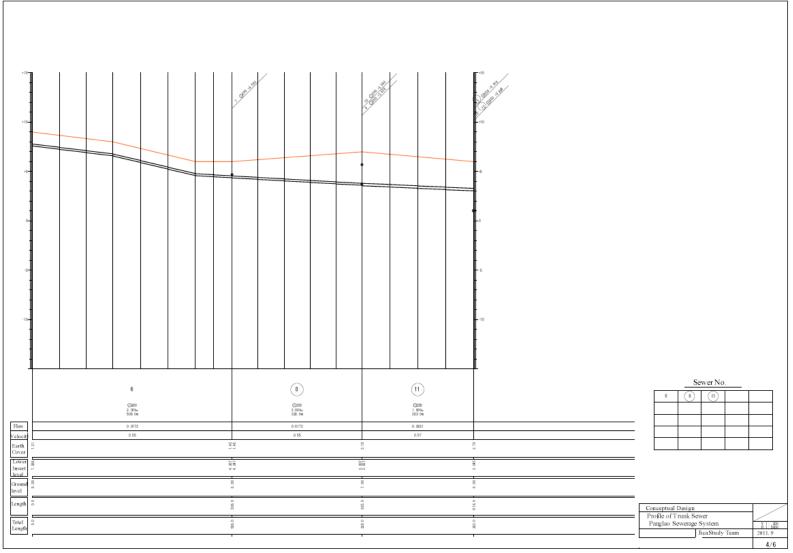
Profile of Trunk Sewer (Panglao Sewerage System)
